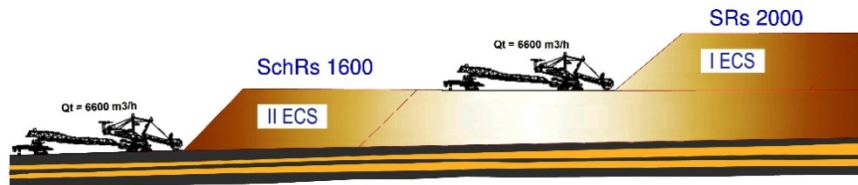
Continuous equipment on overburden excavation on opencast mine Tamnava West Field.
